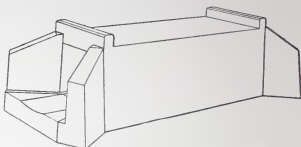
Perspective of Typical Reinforced Concrete Box Culvert shown in Figure 25.
